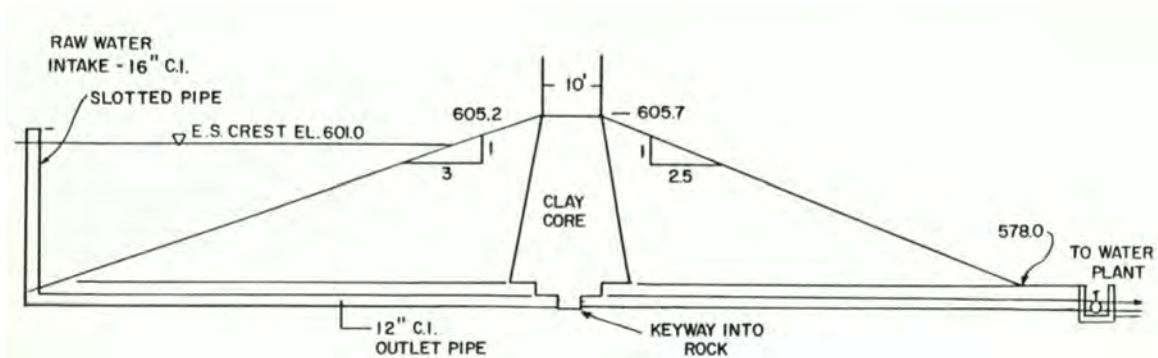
Cross-Section along Outlet Pipe from 1979 Phase 1 Inspection Report
